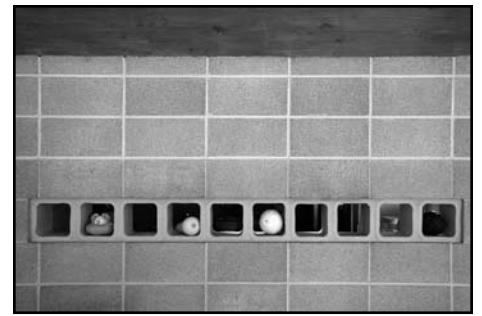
Interior wall of Jaffe-Garrett house illustrating Reed's creative use of concrete masonry [photo by Louis Friend, 2006]
